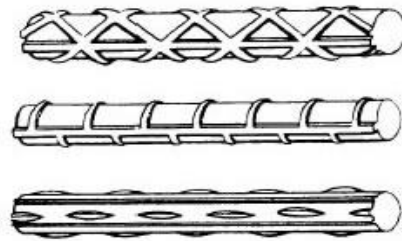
Rebars prone to early corrosion leading to distress and decay in concrete.
